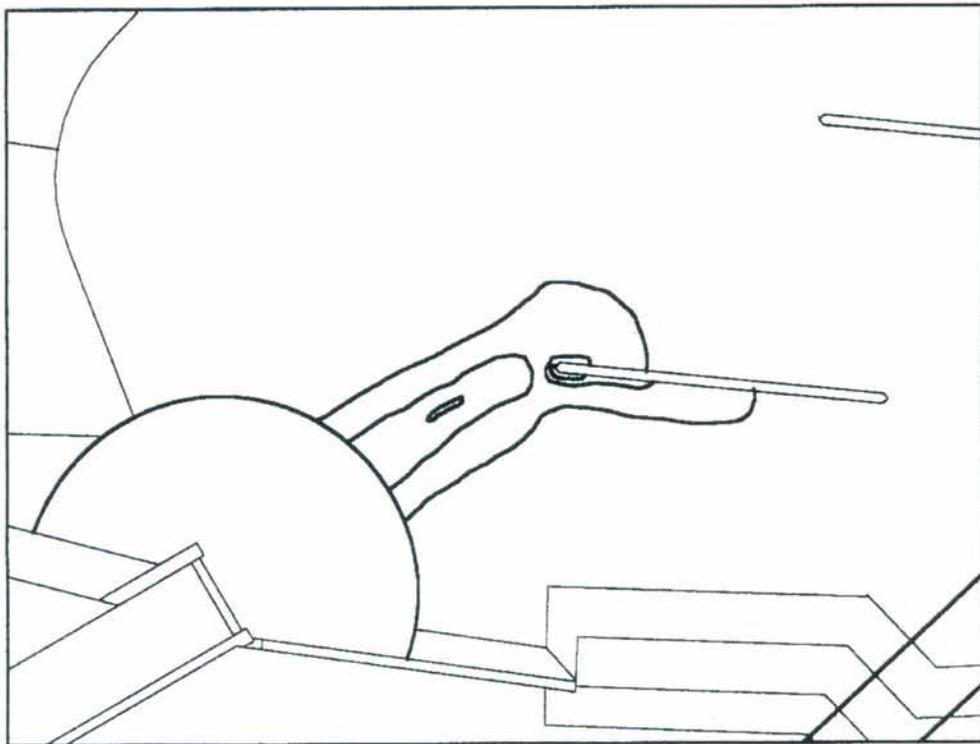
Scour pattern around the bridge pier, 2-year flood. Two foot contours.
